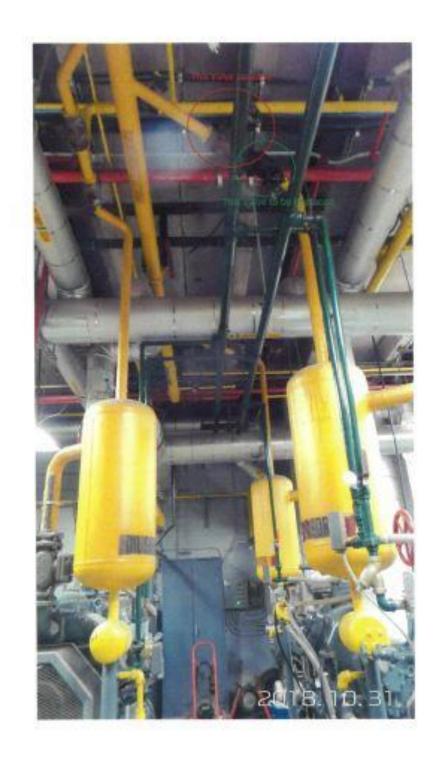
Discharge valve (Closed) and check valve (to be replaced)
